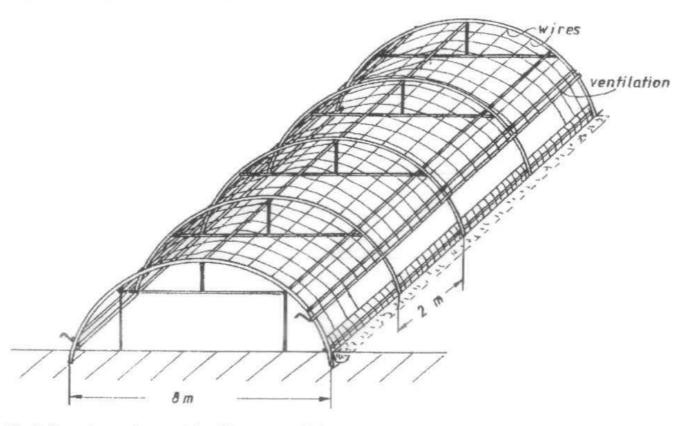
Tunnel-greenhouse with rolling-up ventilation.
